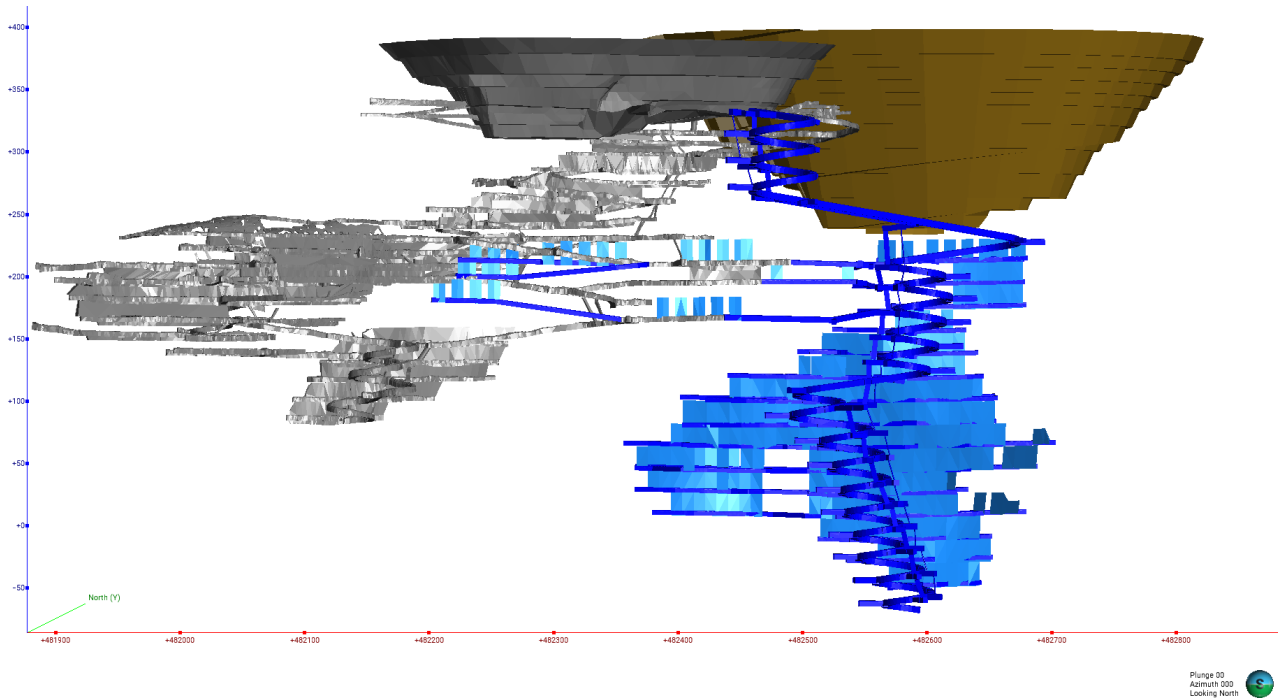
Coyote Central underground mine design (blue) looking north. Existing infrastructure (grey) also shown.
